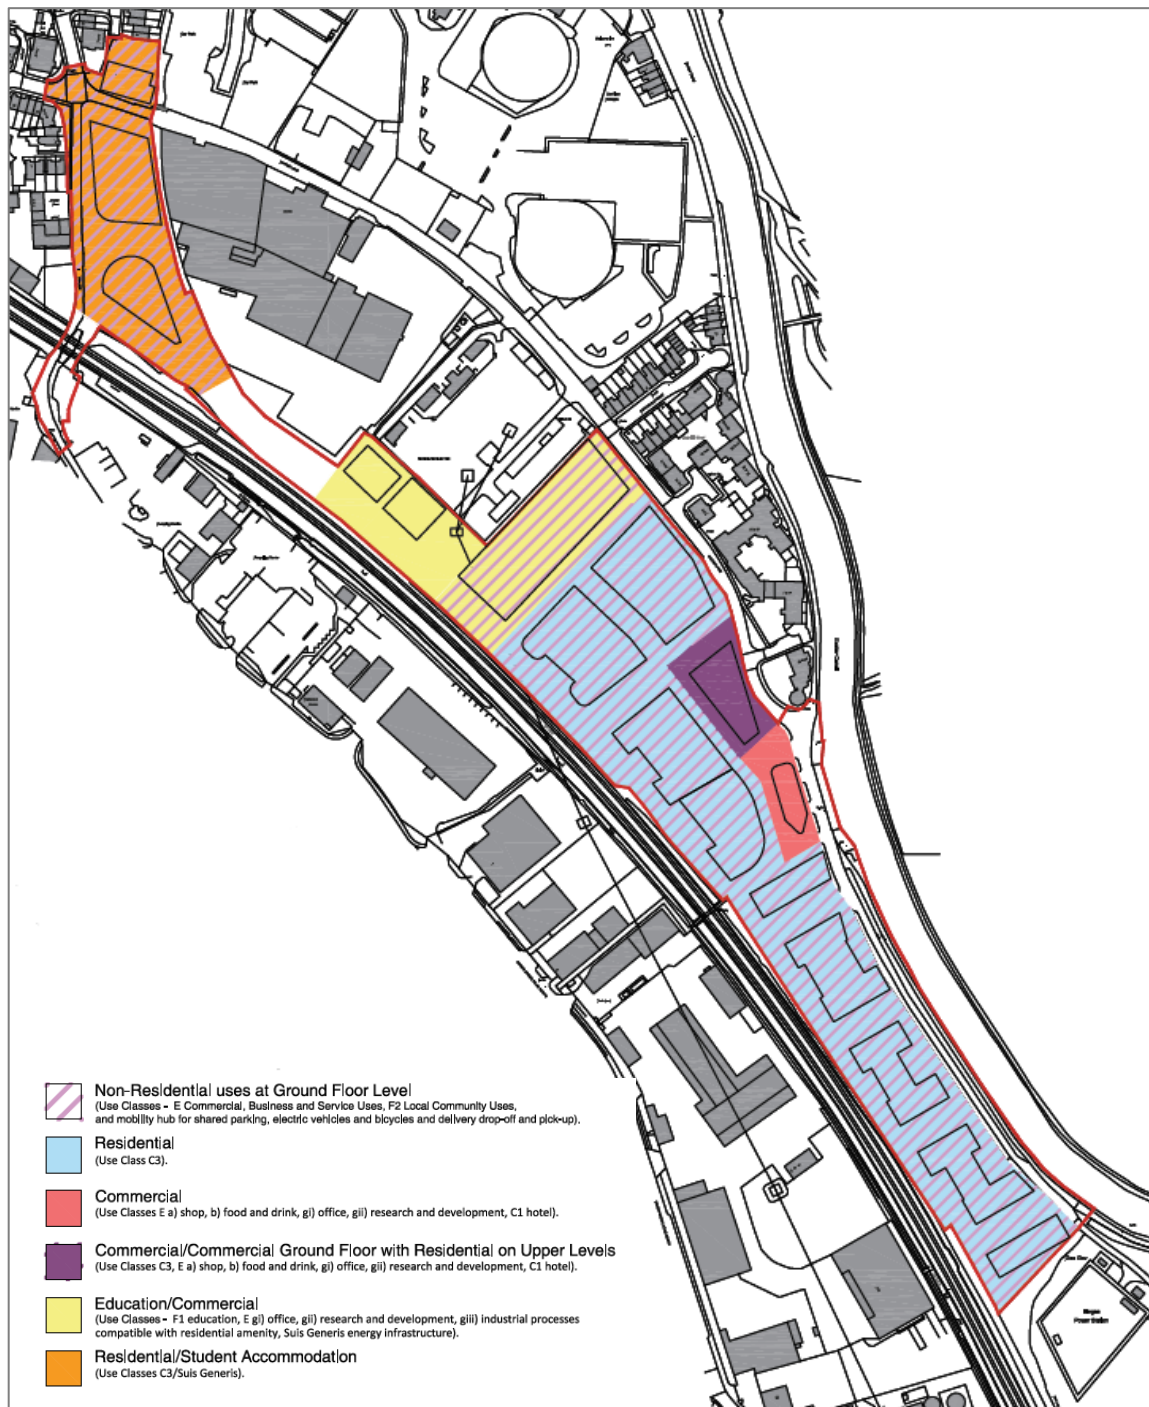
Extract of Proposed Parameter Plan with Disposition of Uses
